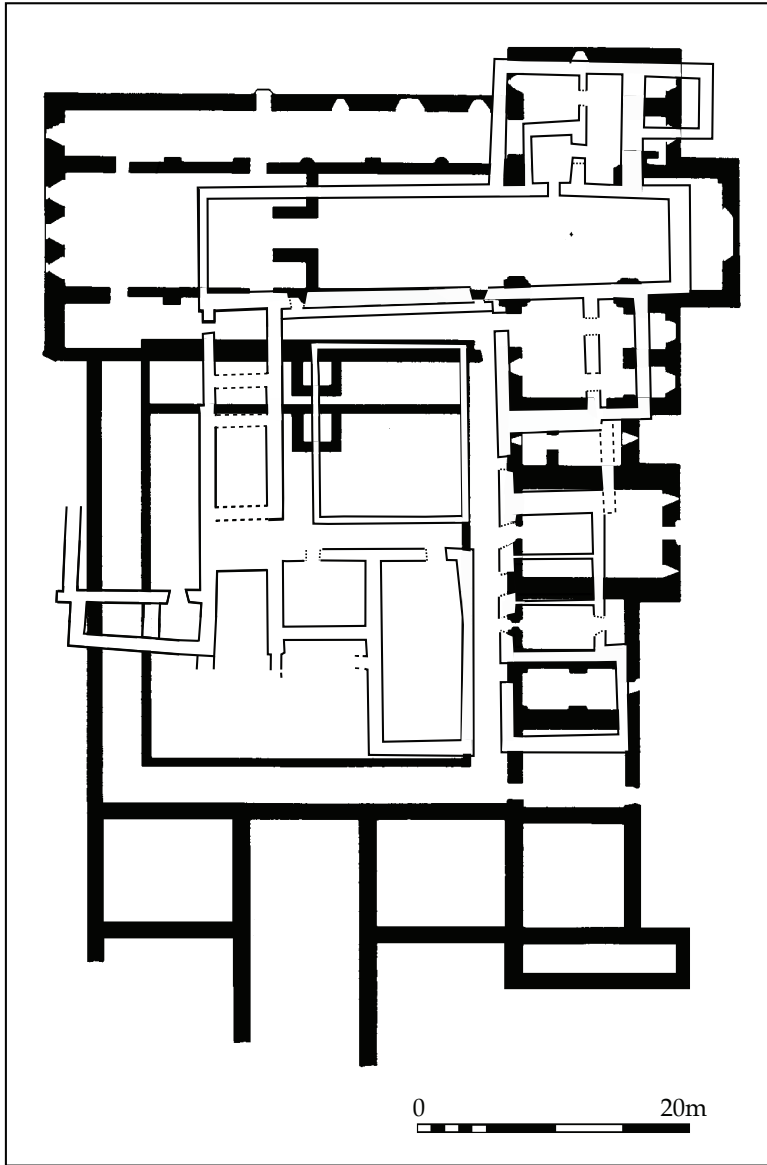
Excavation plan of Rushen Abbey (white walls) overlain on a plan of Jerpoint (black walls) at the same scale.
